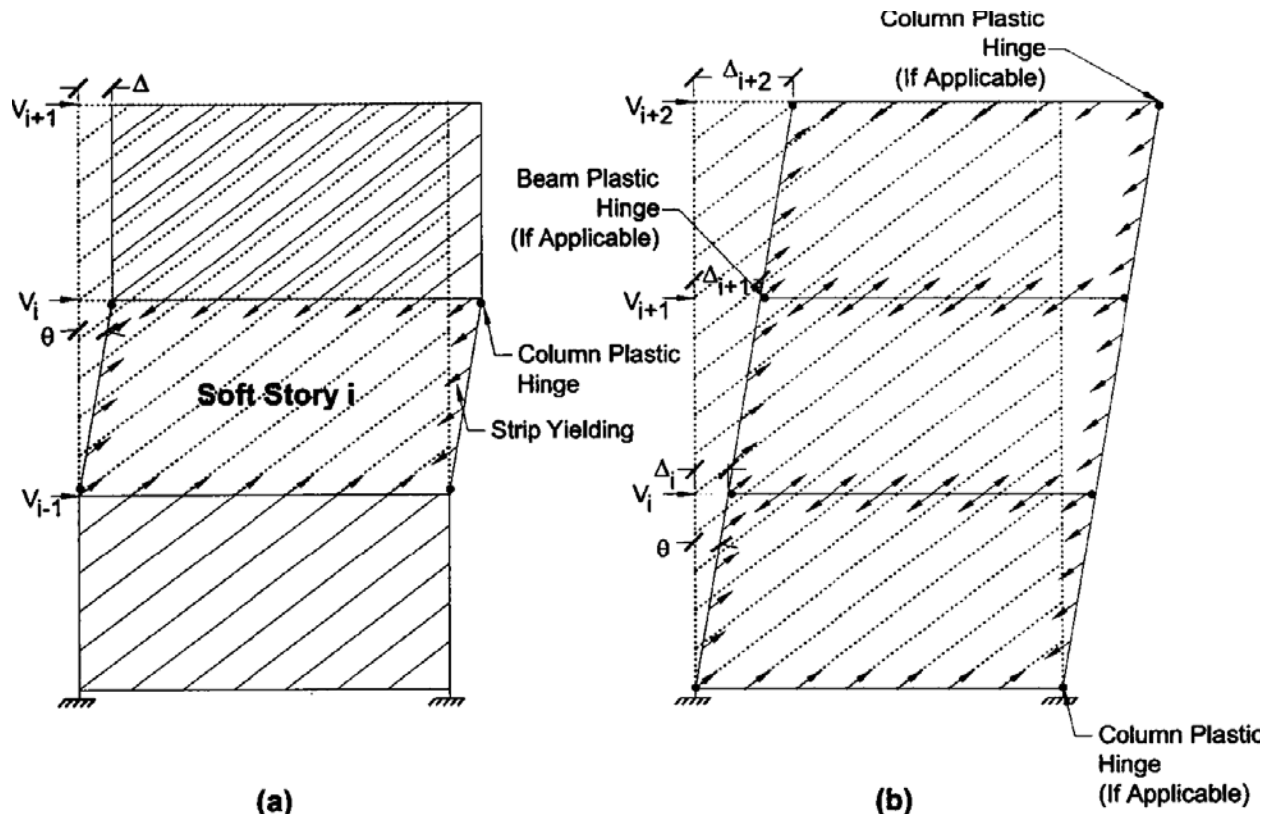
Examples of Plastic Collapse Mechanisms for Multistory Steel Plate Shear Walls (Berman and Bruneau 2003)
